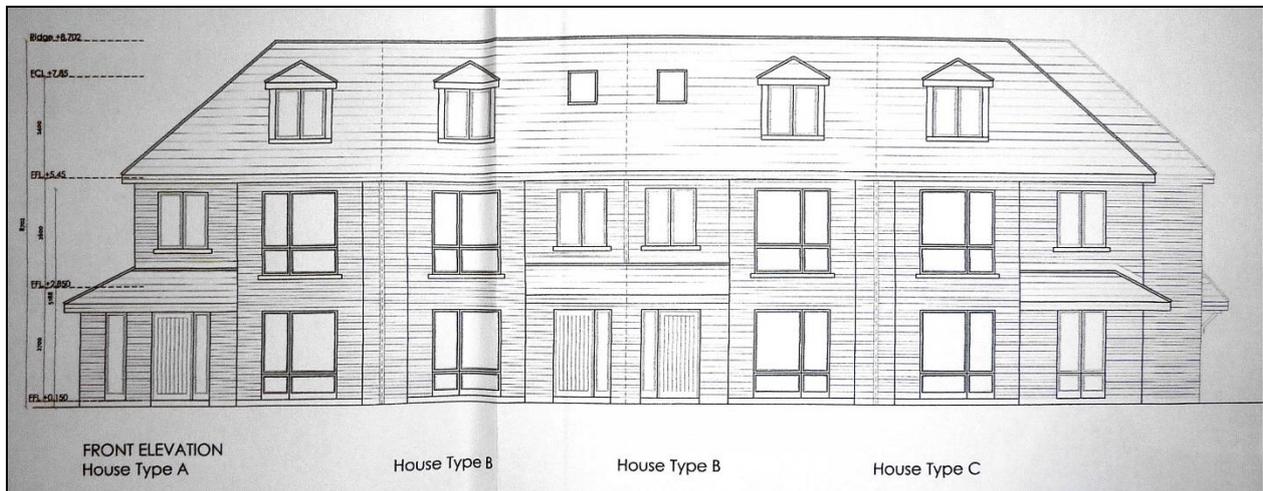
Front elevation of the four 4-bed terraced houses proposed in RA/180833. The building is clearly three-storey, and the lower floors are very apartment-like in appearance
